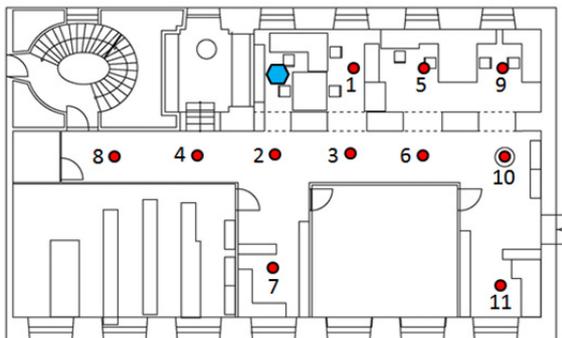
Schematic plan of the office area (SR: seminar room; OP: open-plan office area)
